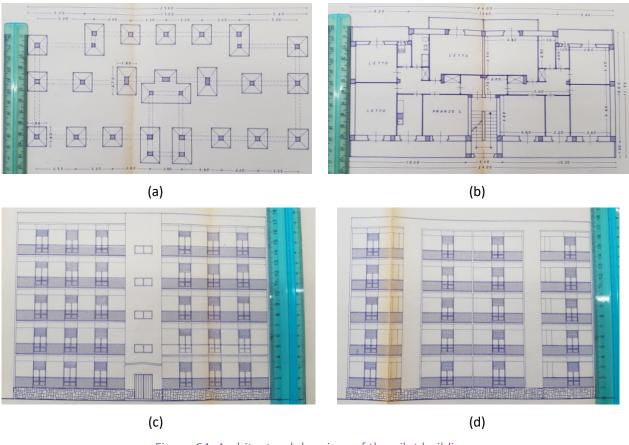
Architectural drawings of the pilot building. (a) foundations; (b) floor type; (c) north front; (d) south front.
